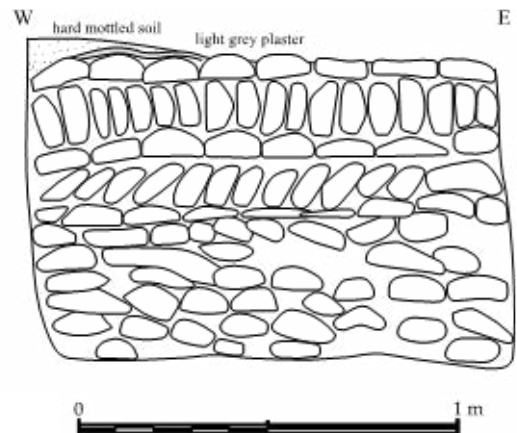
Plano-convex bricks: brick-lay in south wall of Gr 244 (ASE 5: 288 (Fig. 6.2). Cf. ASE 5: p. 289 Photo 6.107, p. 291 Photo 6.111.
